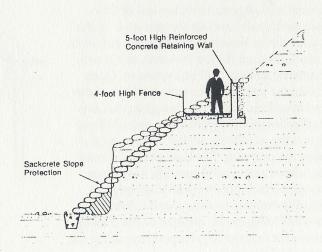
RETAINING WALLS AND SLOPE PROTECTION ALONG STEVENS CREEK AT MERCY STREET
